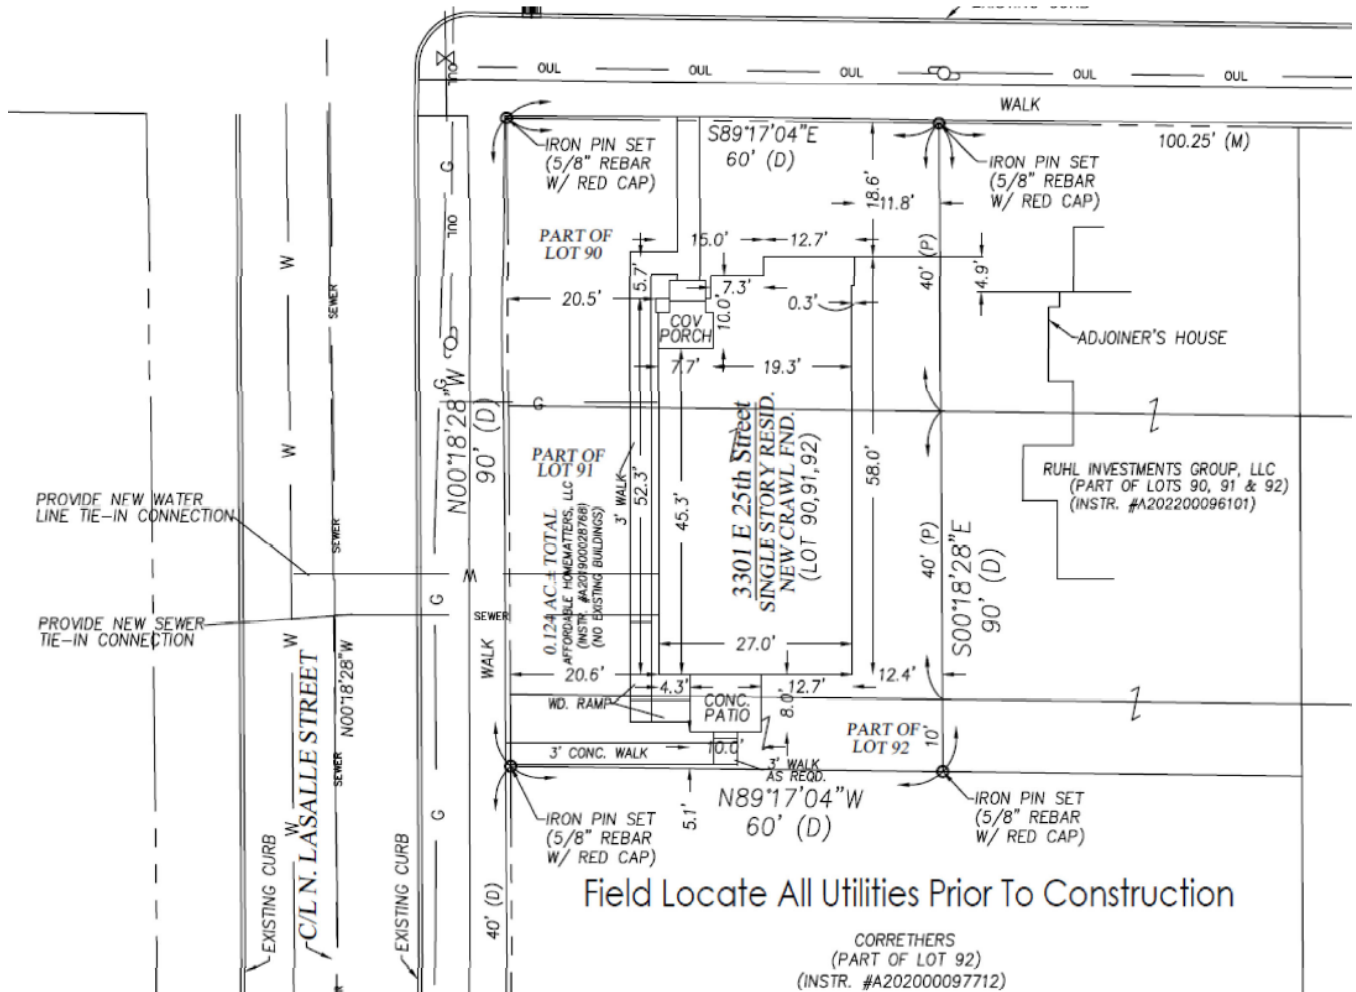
Site plan for proposed single family home at 3301 E 25<sup>th</sup> Street
